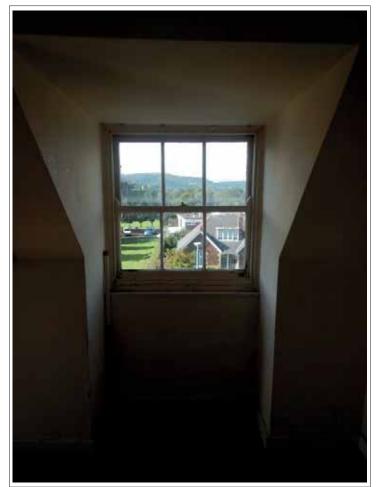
Dormer window to west wall of Room 2.3, looking west. 1m scale.
